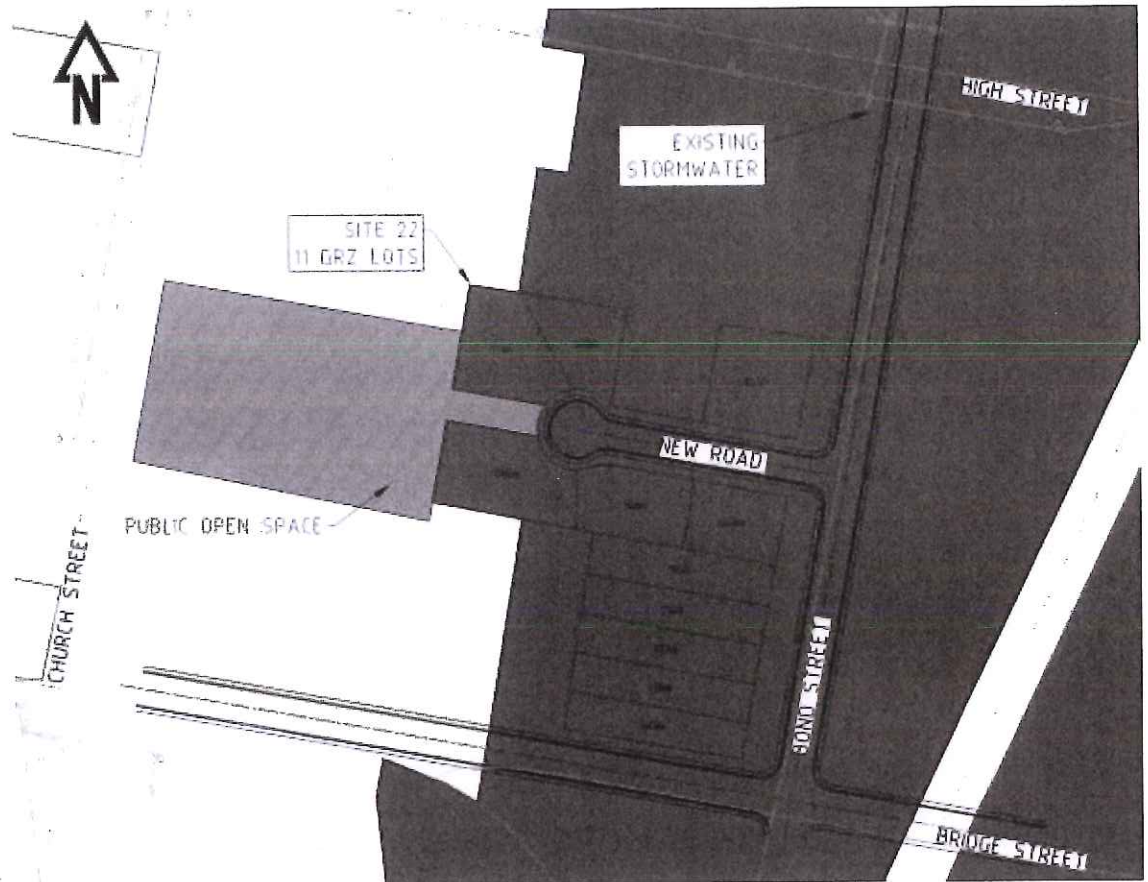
Ross Development Precinct Masterplan off Bond Street (3)
